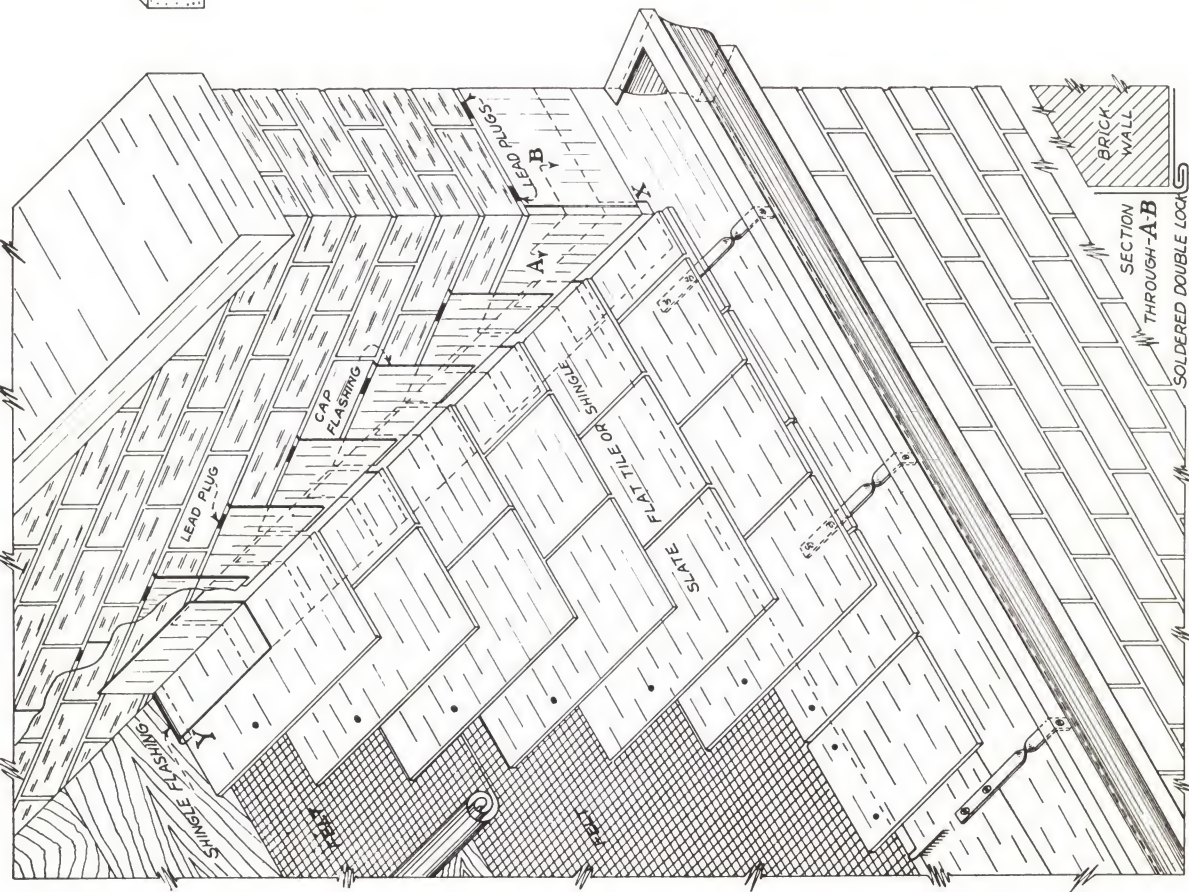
METHOD OF APPLYING SHINGLE AND CAP FLASHINGS AGAINST GABLE WALL WHEN ROOF IS COVERED WITH EITHER SLATE, FLAT TILE OR SHINGLE
